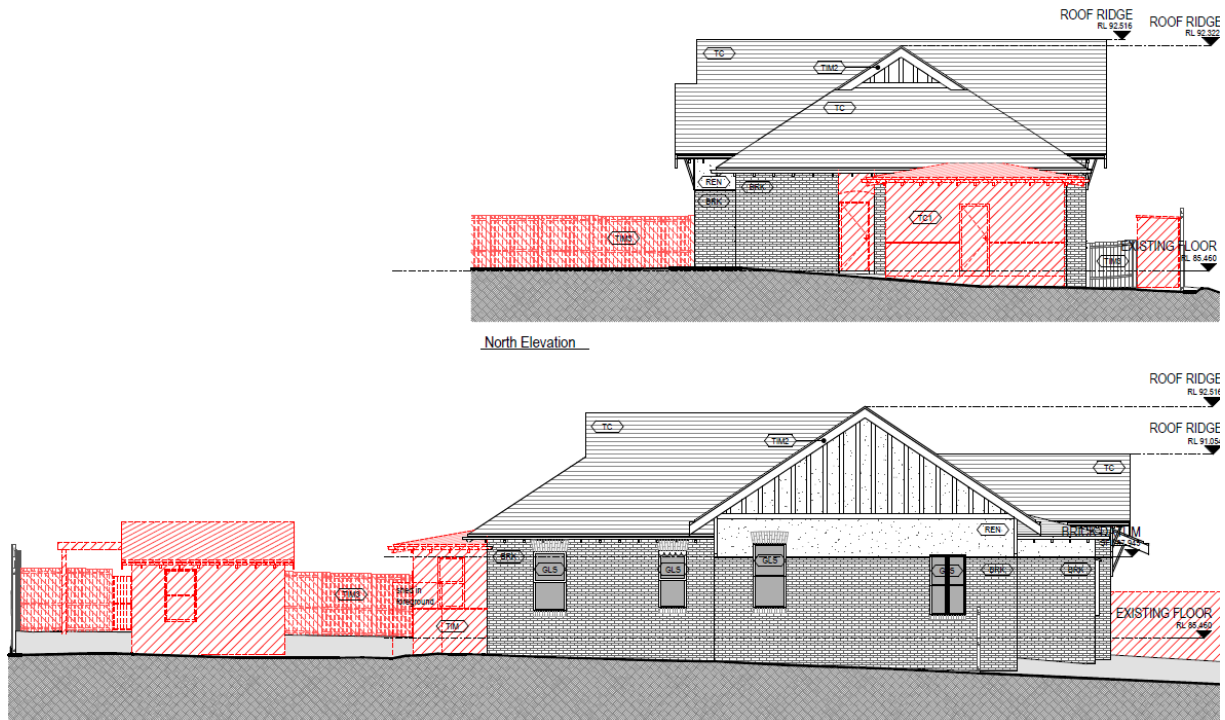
Elevations – Existing & Demo (top: north, bottom: west).
